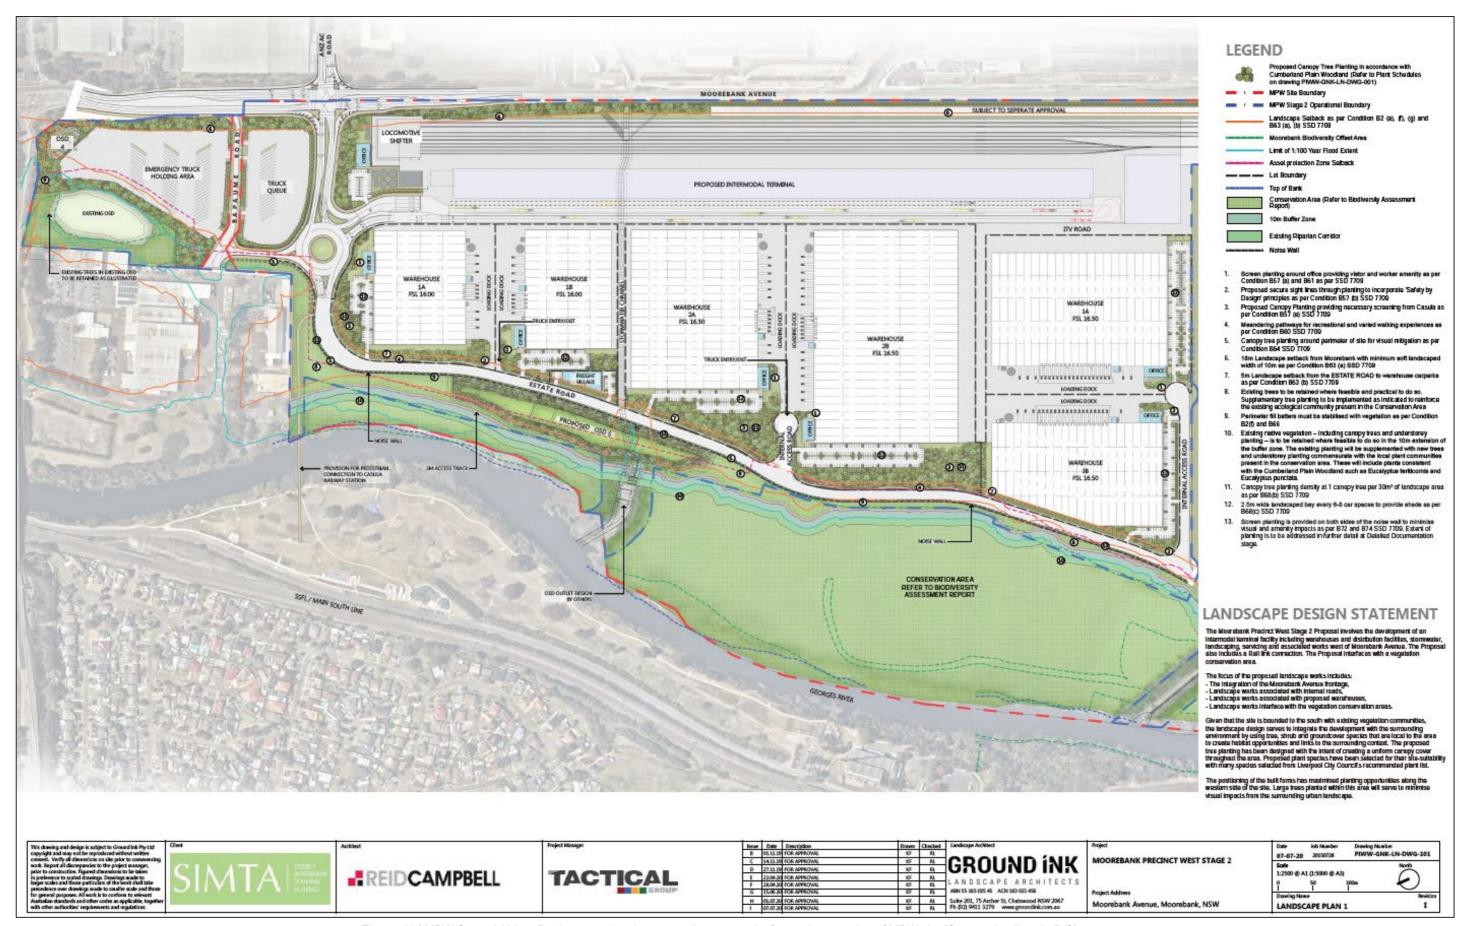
| MPW Stage 2 Urban Design – previously proposed estate works for northern portion of MPW site (Source: Applicant's RtS)
